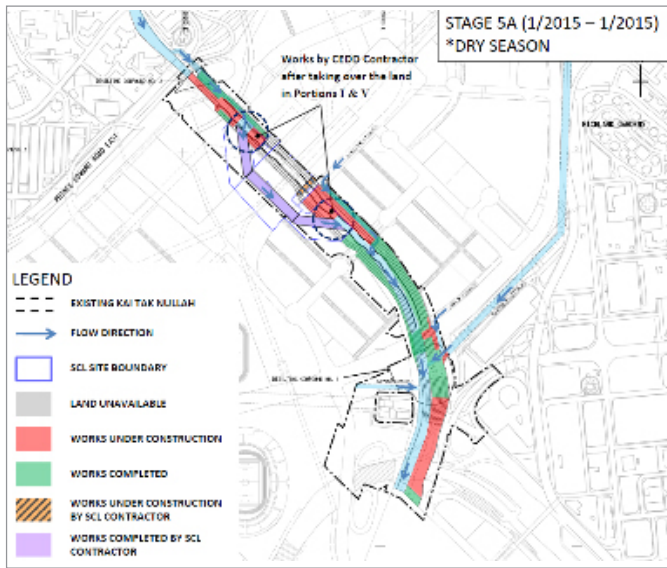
Floor plan to show part of the Kai Tak Nullah was temporary closed
